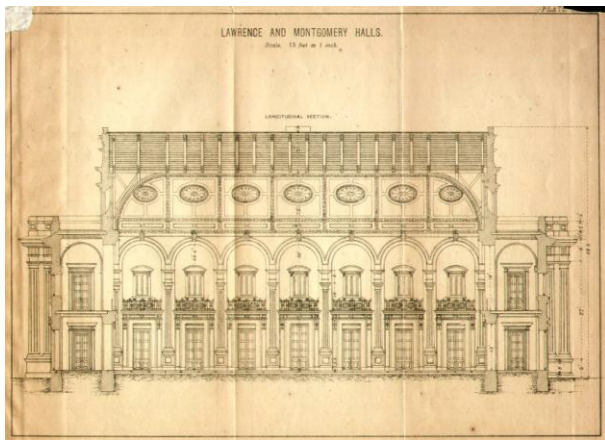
Longitudinal Section of Montgomery Hall showing original details
